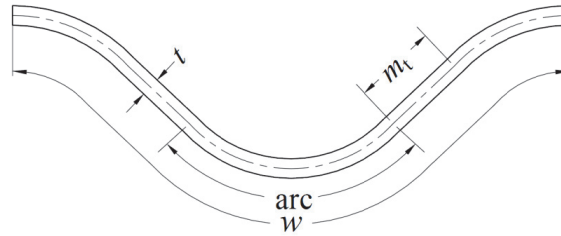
A typical centerline length w of a section of the corrugated culvert steel wall consisting of two full arcs and two straight lines
